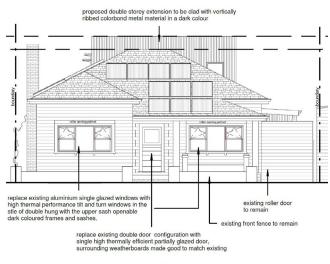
Proposed west elevation of case study building showing proposed changes. Source: Byrne Building Design, 2023
